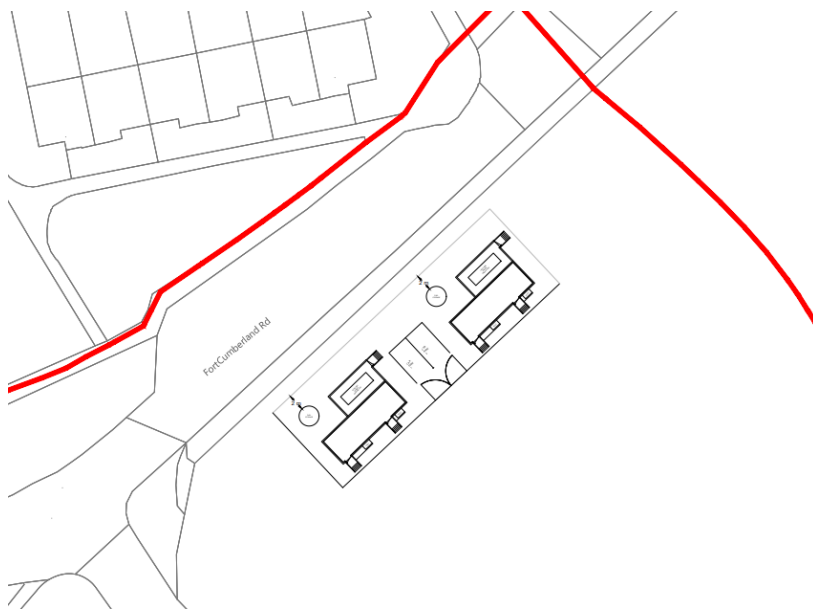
Plan showing Option B footprint (EN020022-2.10-EL-Sheet4)
